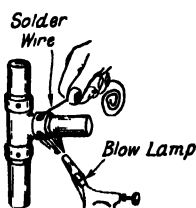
Making a "Sidex" joint by applying solder to touch-holes; joint warmed by blow-lamp.
